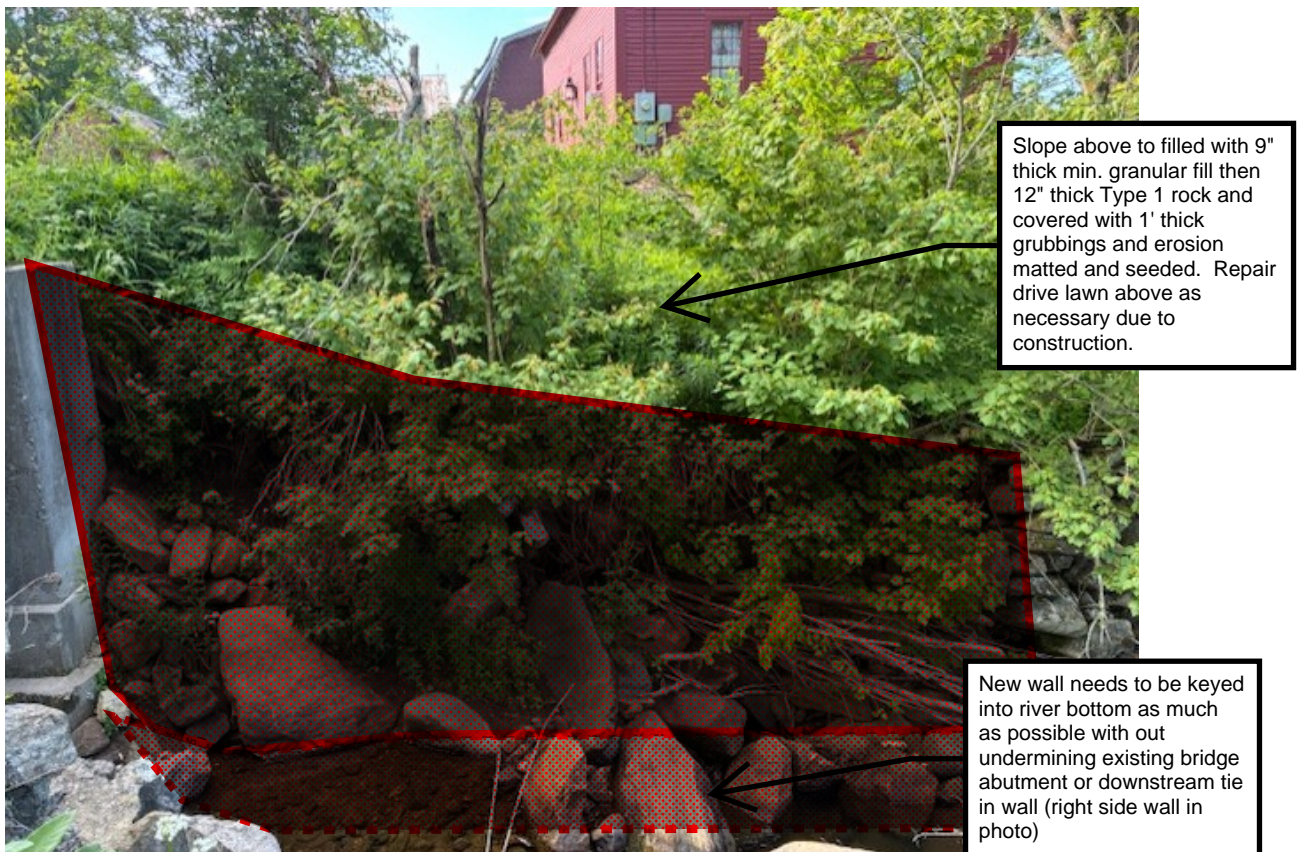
Looking at damaged wingwall from opposite bank
